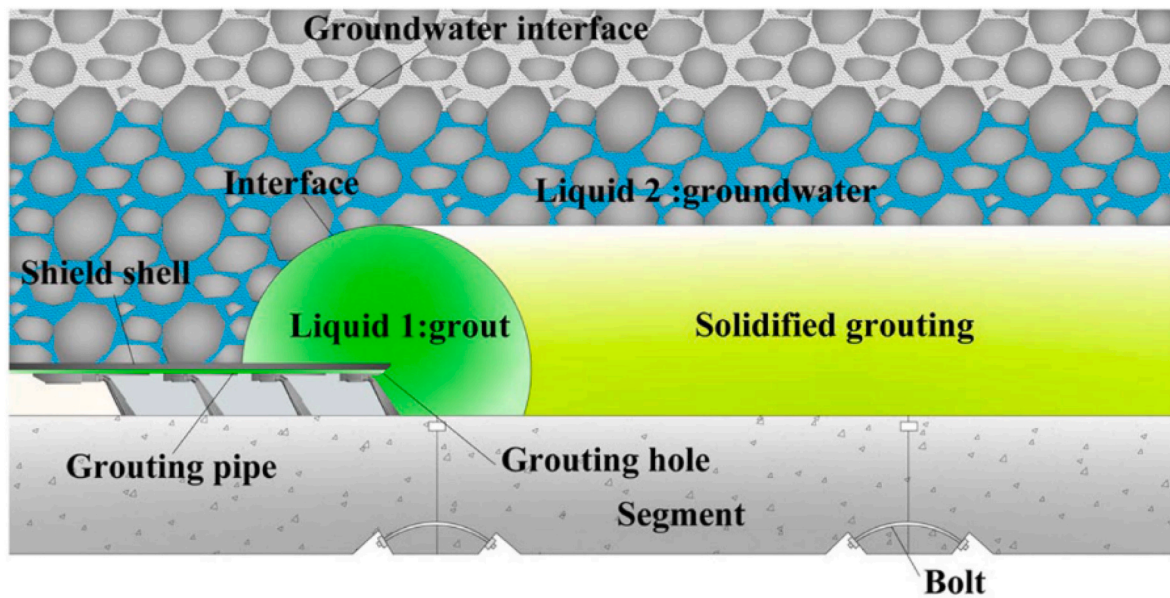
Grouts diffusion and underground water migration in backfill grouting of shield tunnel.
